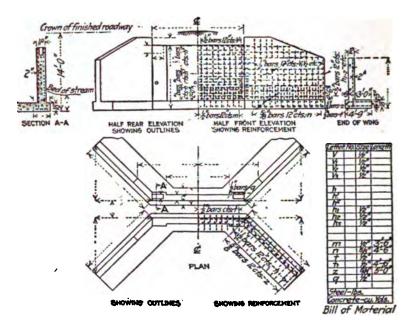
STANDARD ABUTMENTS FOR A CONCRETE GIRDER BRIDGE.
